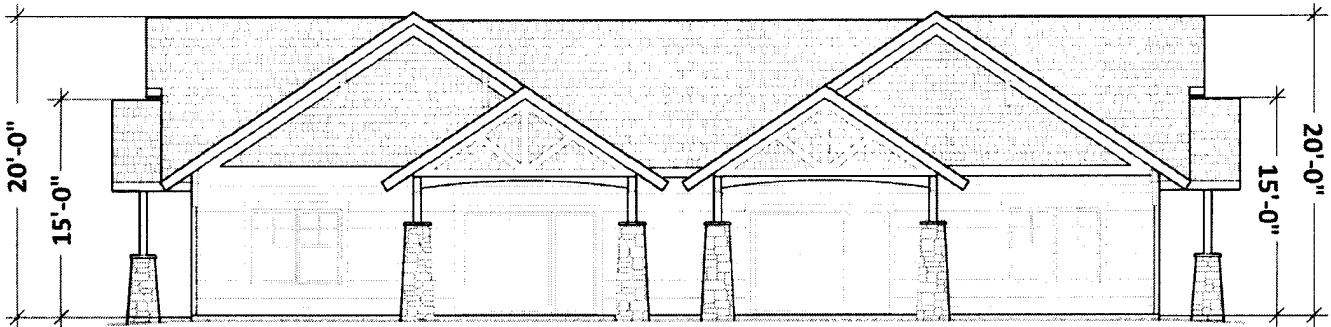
" LEFT AND RIGHT EXTERIOR ELEVATIONS
